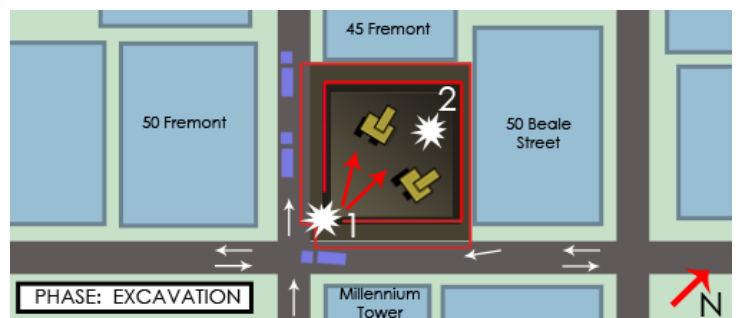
Soil will be removed from the site in similar fashion to how materials were transported during the establishment of the shoring system.
